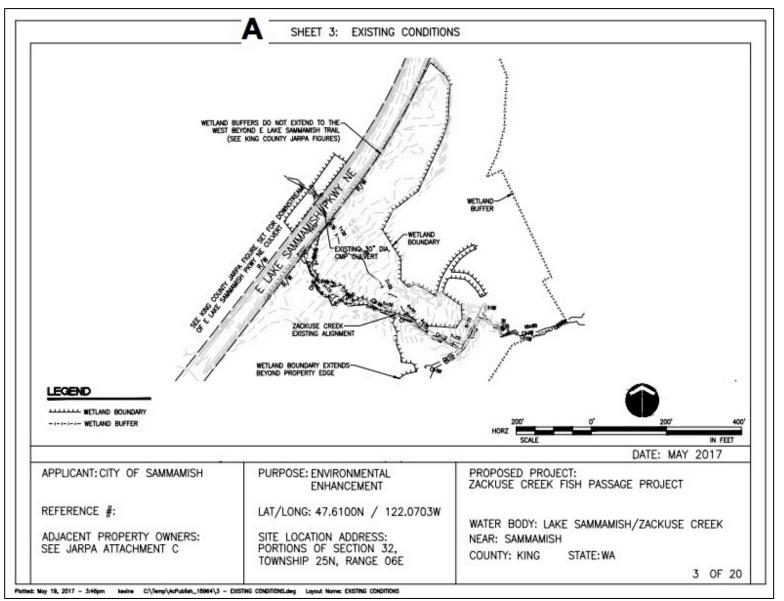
Project plans – existing conditions, provided by Otak, Inc.
